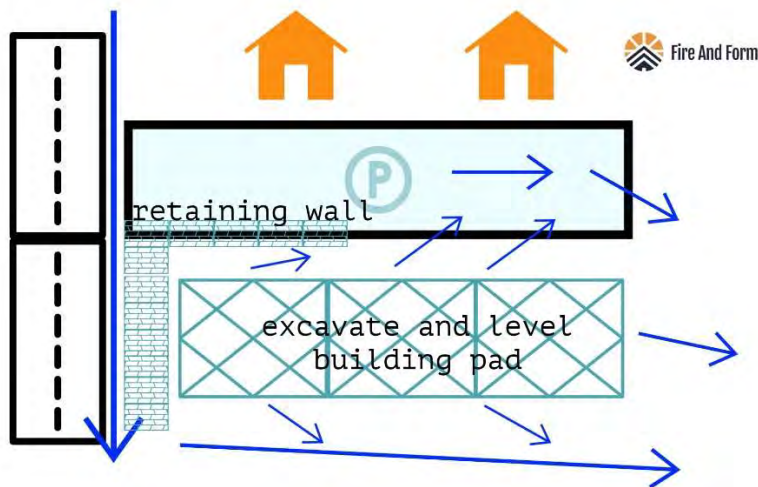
Modified Grading Schematic for Near Grade Finished Floor Elevation
